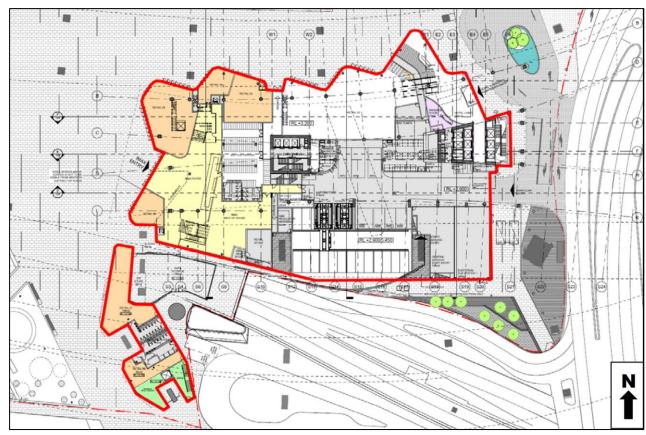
Approval ground floor and podium building footprint (outlined in red) (Source: SSD 7388)
